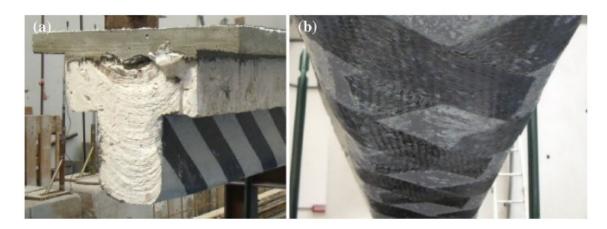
Retrofitting of the beam specimens: a C-FRP Strips for shear reinforcement and RC slab for flexural reinforcement; b intersection of the C-FRP strips at the beam intrados[8R].
